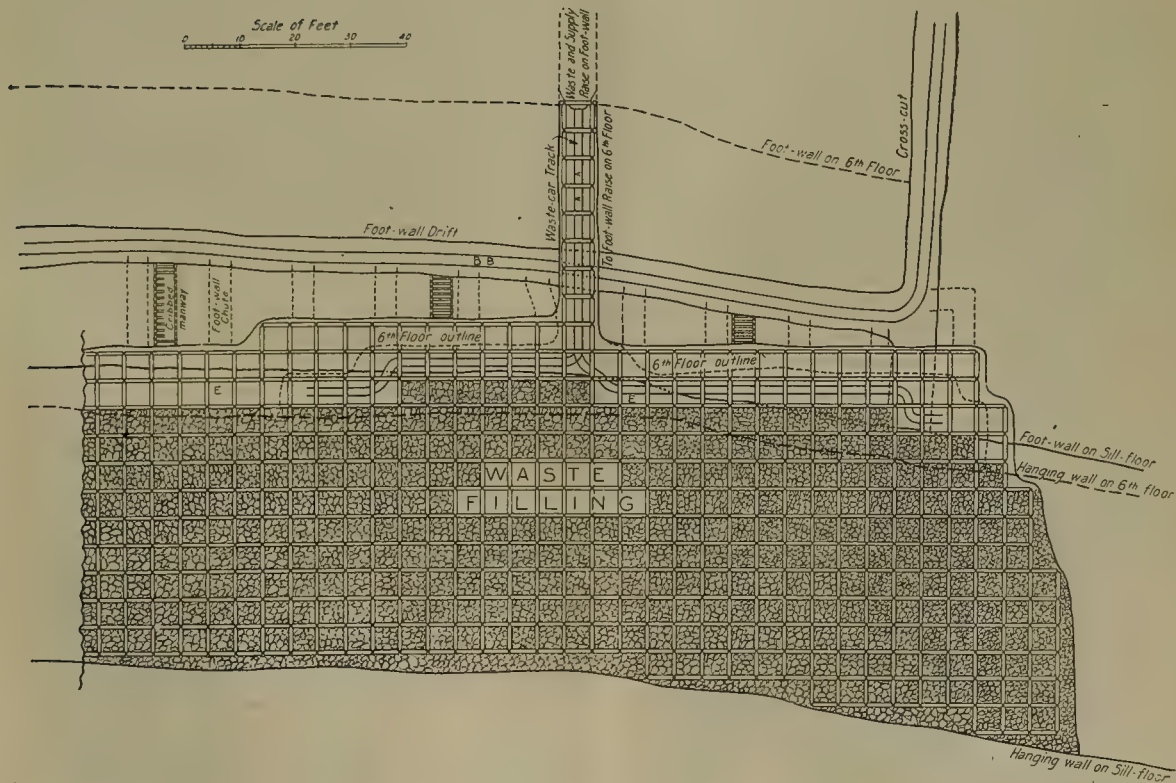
PLAN, SHOWING PRESENT SYSTEM OF MINING
